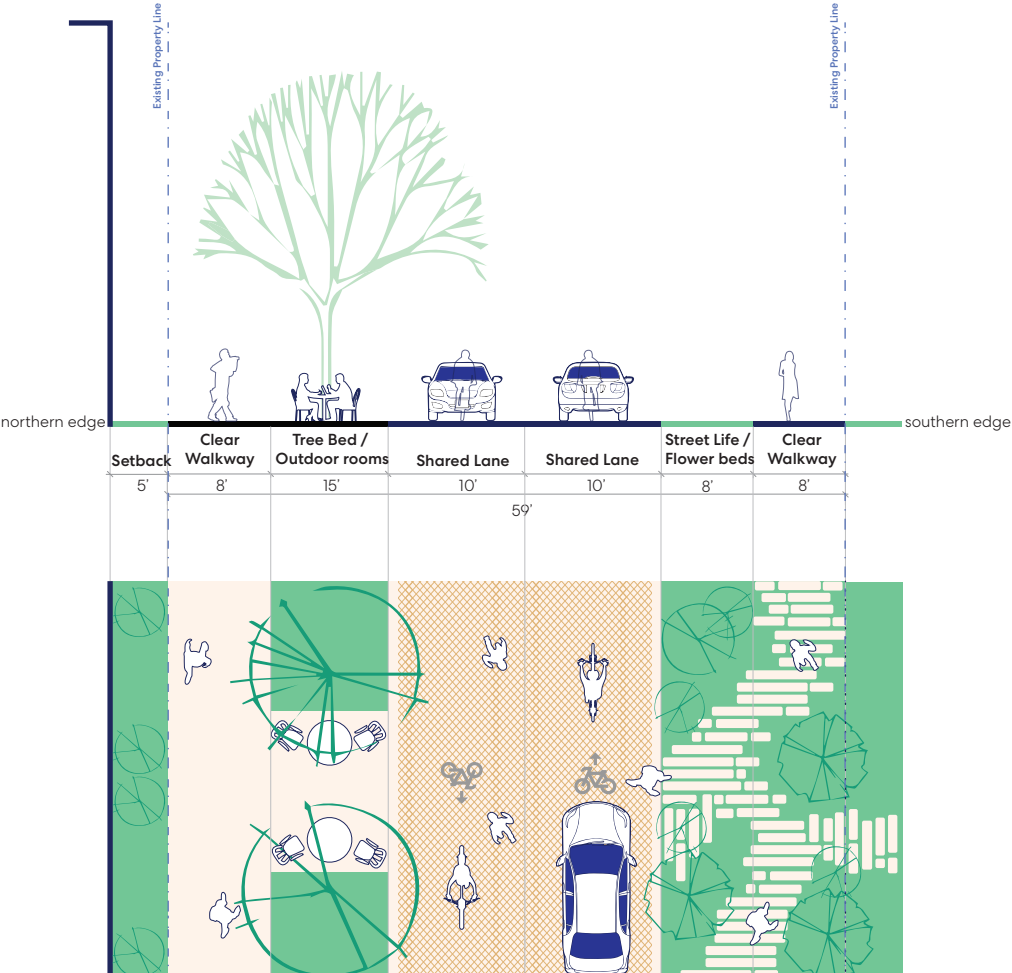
Typical Portage Avenue section between Park Boulevard and Ash Street
